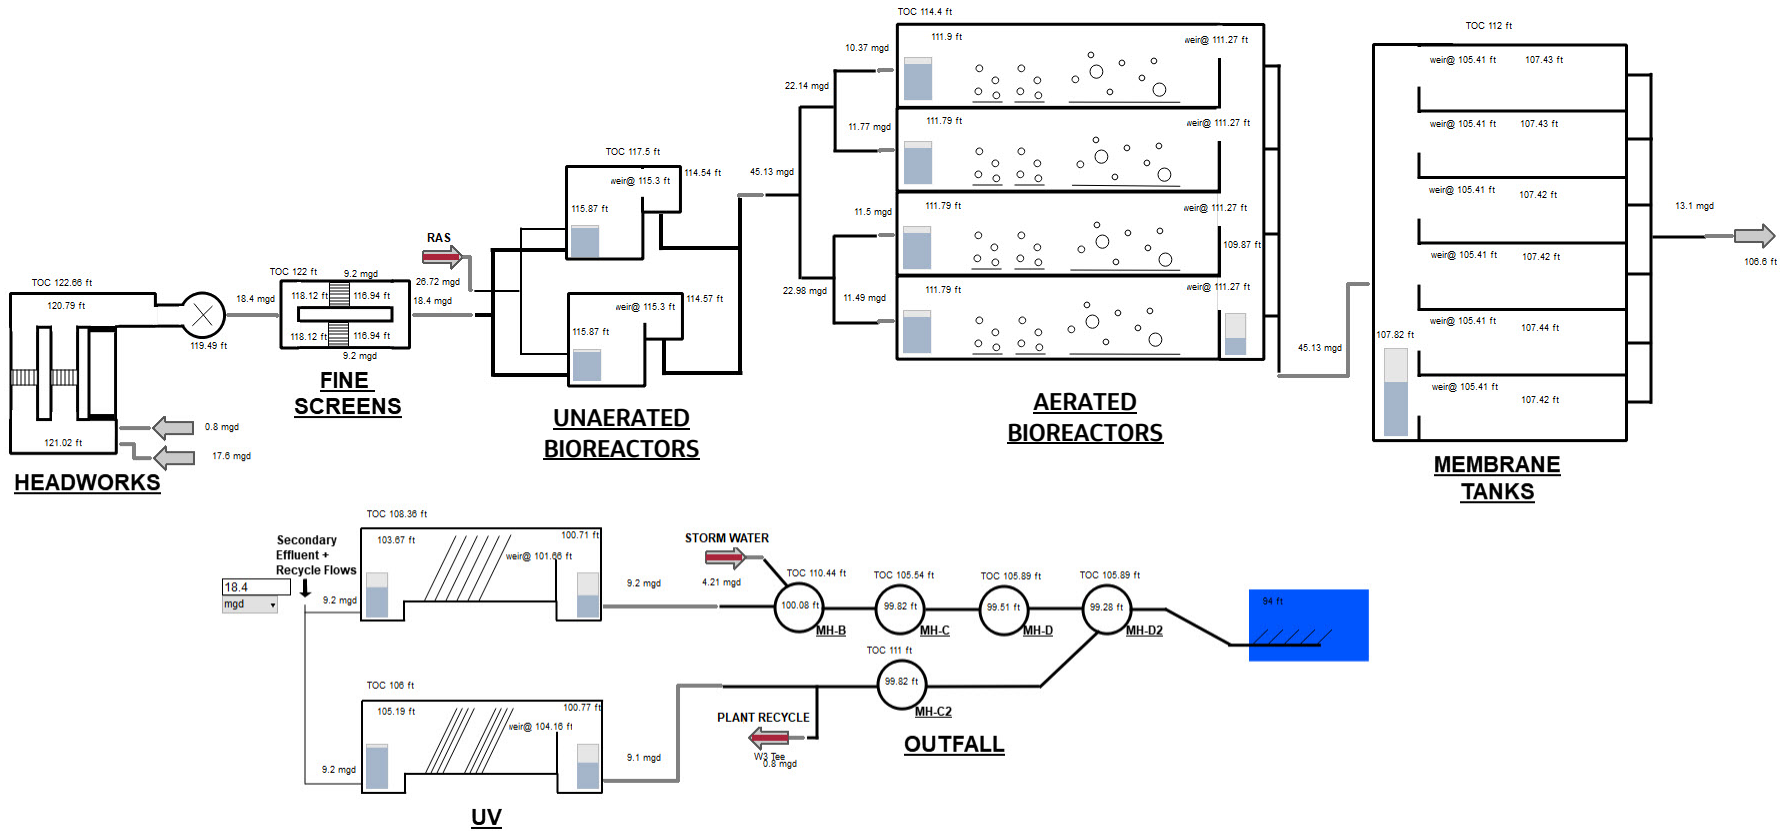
Water Surface Elevations: All basins online, 100-year River Elevation
